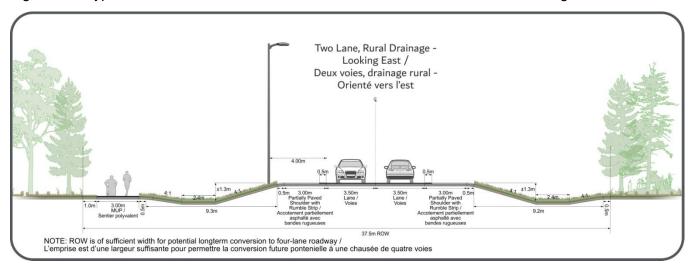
Typical Two-Lane Rural Cross-Section for the Extension of Earl Armstrong Road
